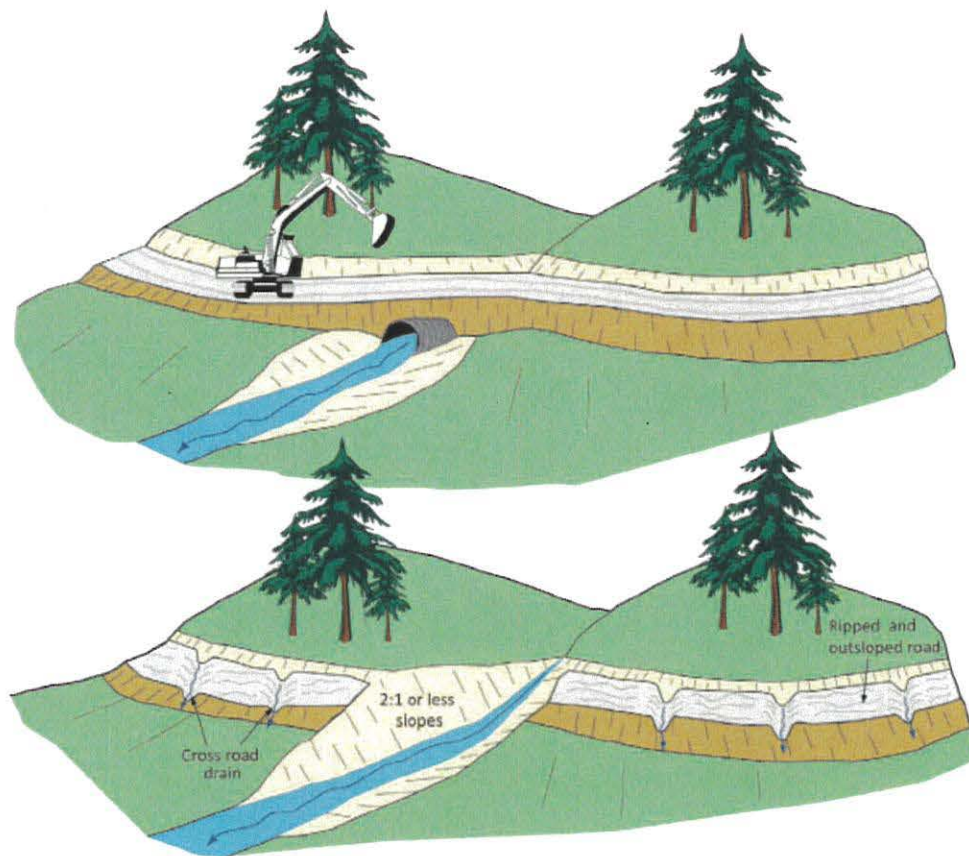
On roads that are to be closed (decommissioned), all stream crossing culverts and fills should be removed. Stream crossing excavations are best performed using an excavator. The original channel should be excavated and exhumed down to the former streambed, with a channel width equal or greater than the natural channel above and below the crossing. Sideslopes should be laid back to a stable angle, typically a 2:1 (50%) gradient, or less. Spoil can be endhauled off-site or stored on the road bench adjacent the crossing, provided it is placed and stabilized where it will not erode or fail and enter the stream.
